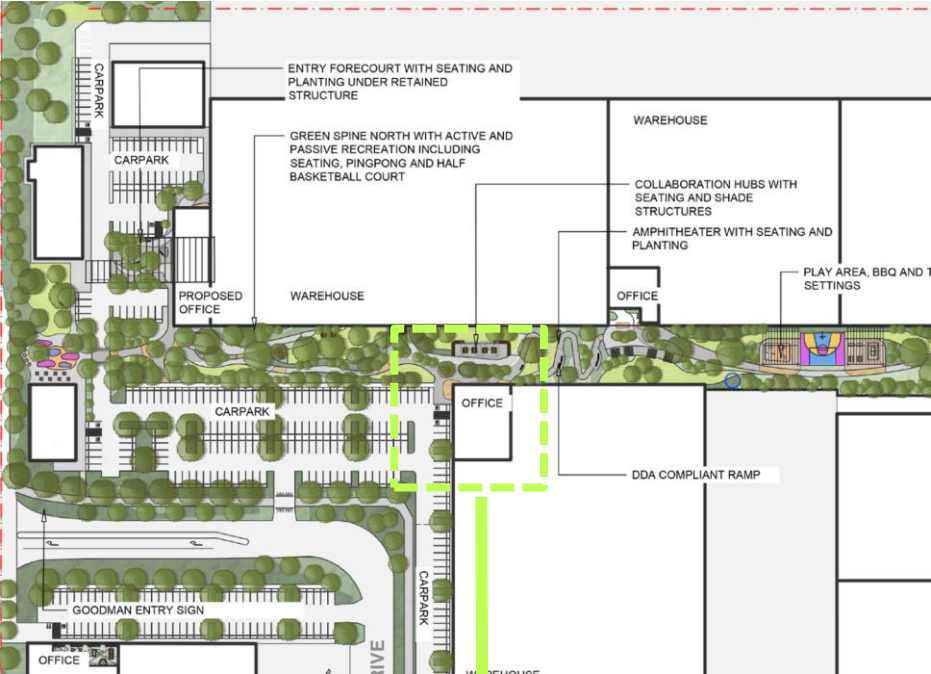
'Green Spine' Plan – internal (Source: Group GSA, 2023)
